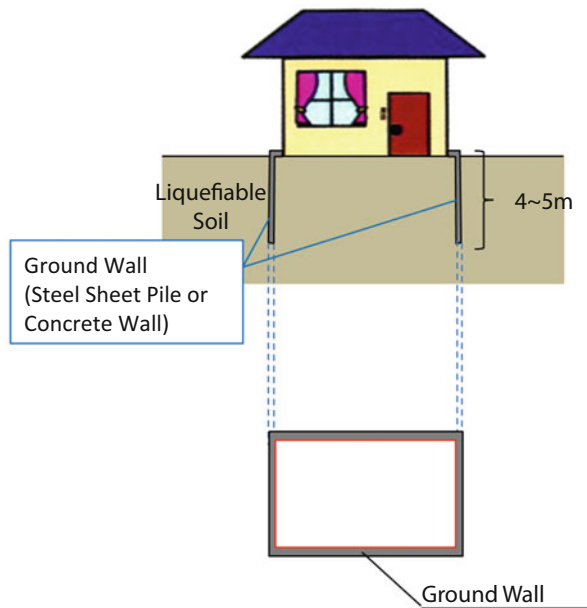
illustrates a countermeasure in which steel sheet piles are used to construct shallow walls around house basements, for preventing the flow of liquefiable soil in the horizontal direction under the house, thereby reducing settlement and inclination.
